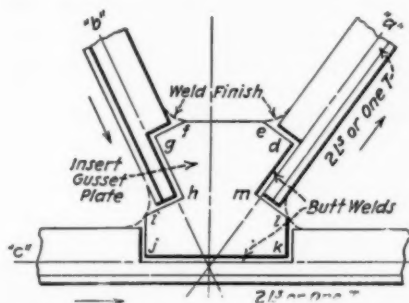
Typical Insert Plate Joint for Angle Iron Sections
